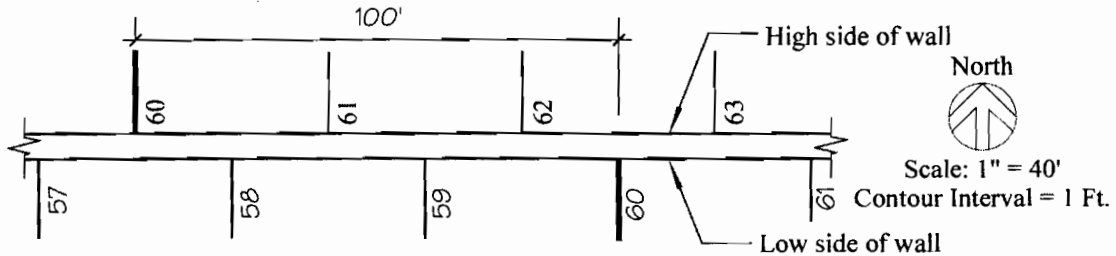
Example 1 — Solution Showing Contour 60 on South Side of Wall
